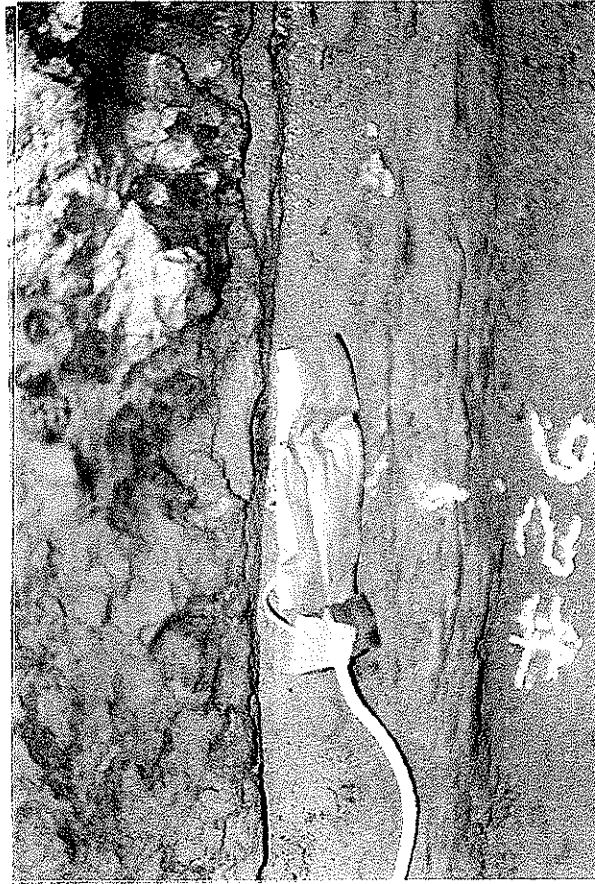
Span 1, Gage Installations at Floorbeam 8 West
